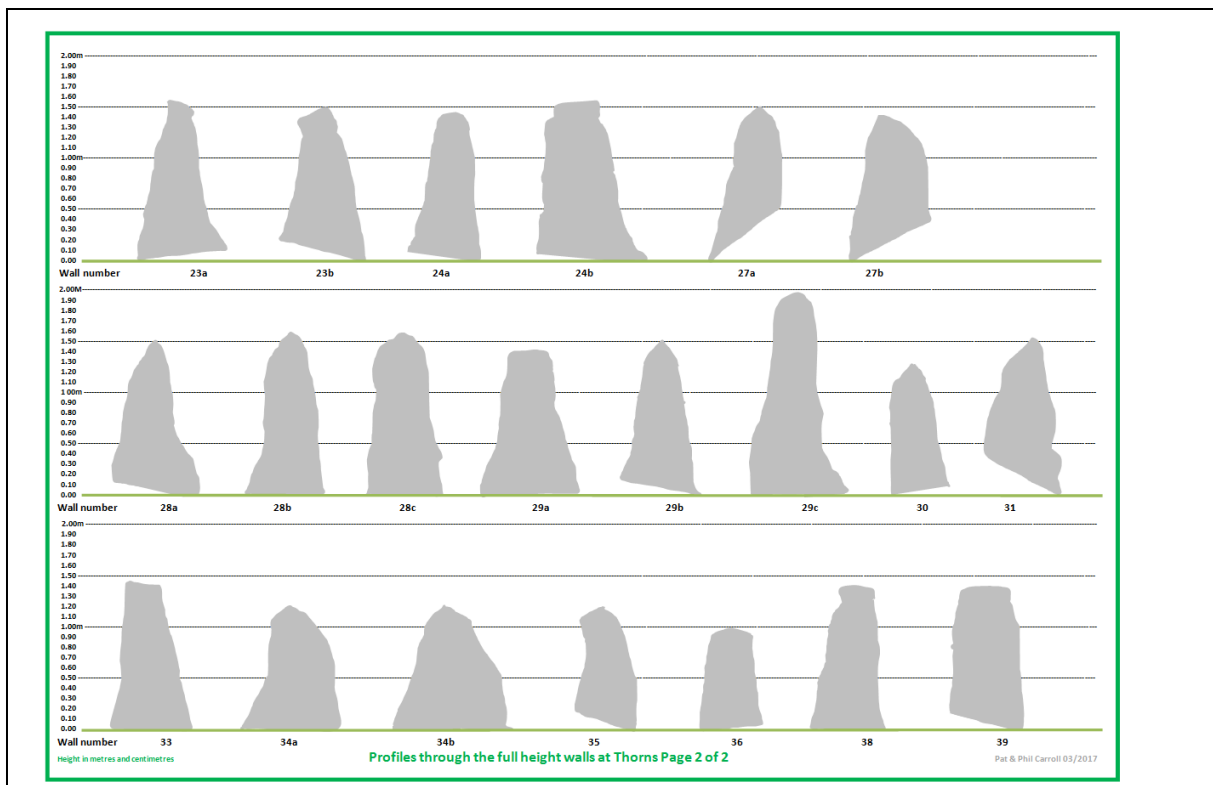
Cross-profiles for Wall nos. 23a – 39
